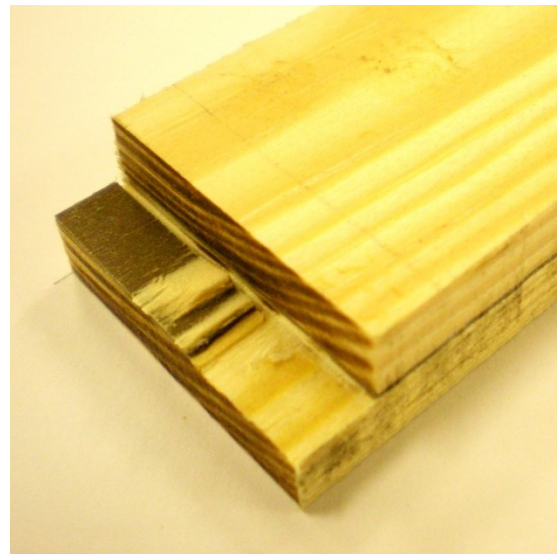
Adhesive failure in TAST tested Timberset sample
